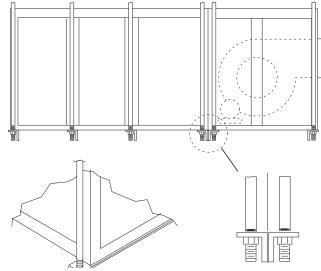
Ceiling Suspended w/o Base Rail— Modular Construction
